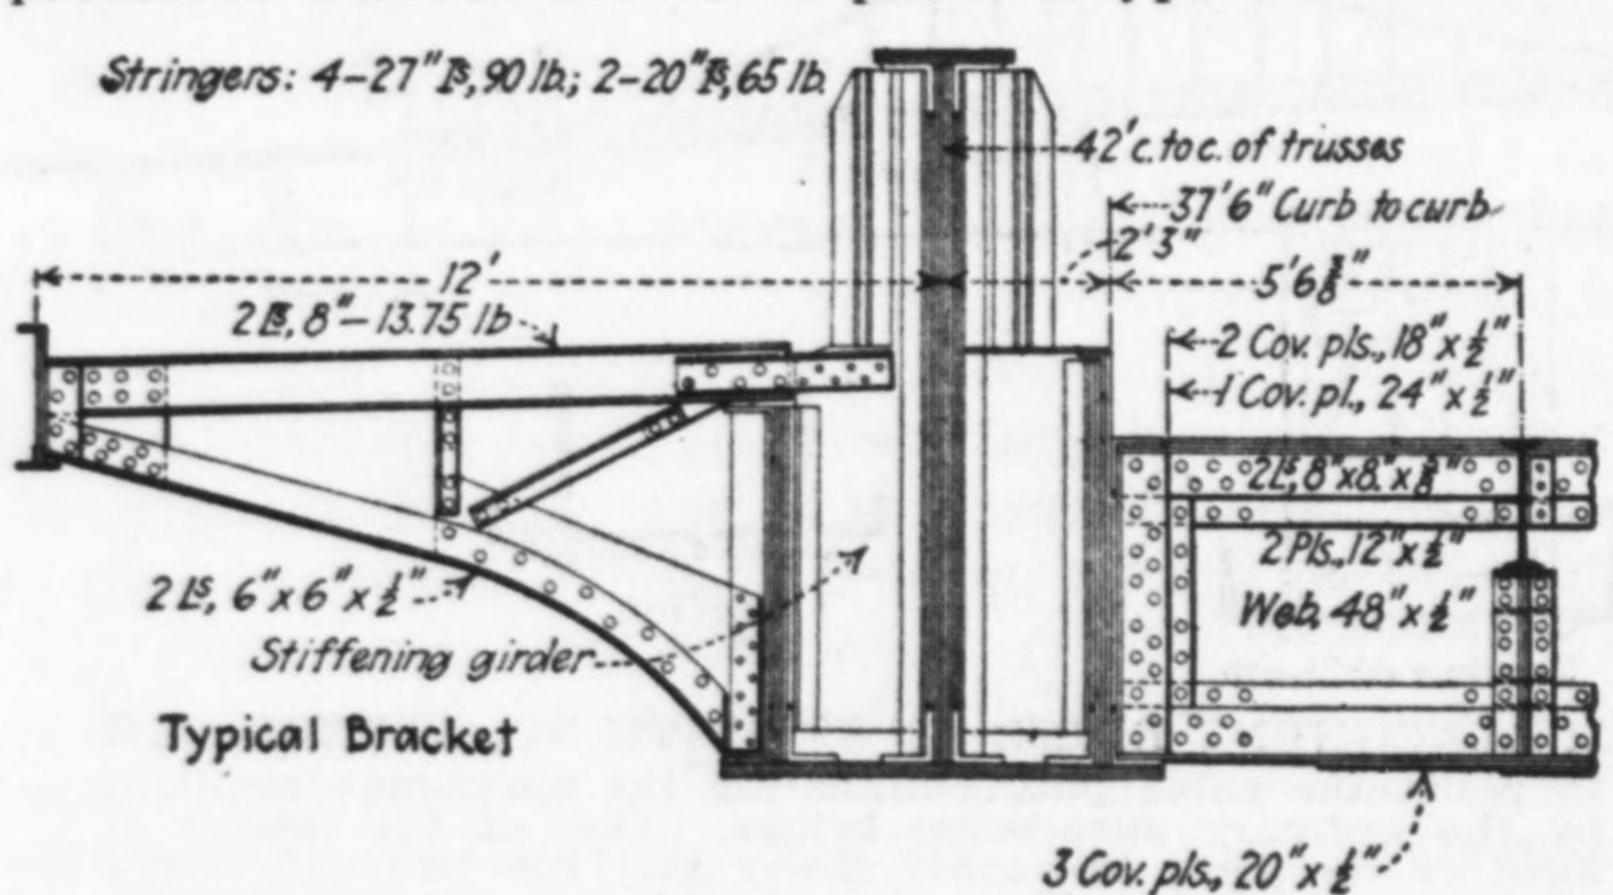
CONNECTION OF FLOOR AND STIFFENING GIRDER
